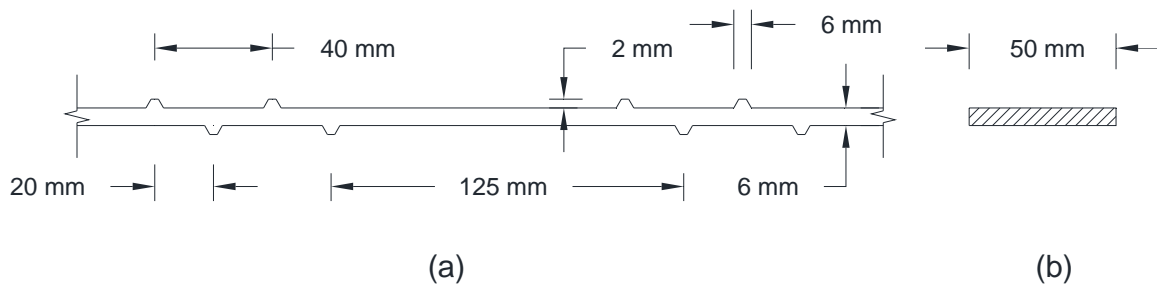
Steel ribbed reinforcement dimensions (a) elevation view, and (b) cross-section.
